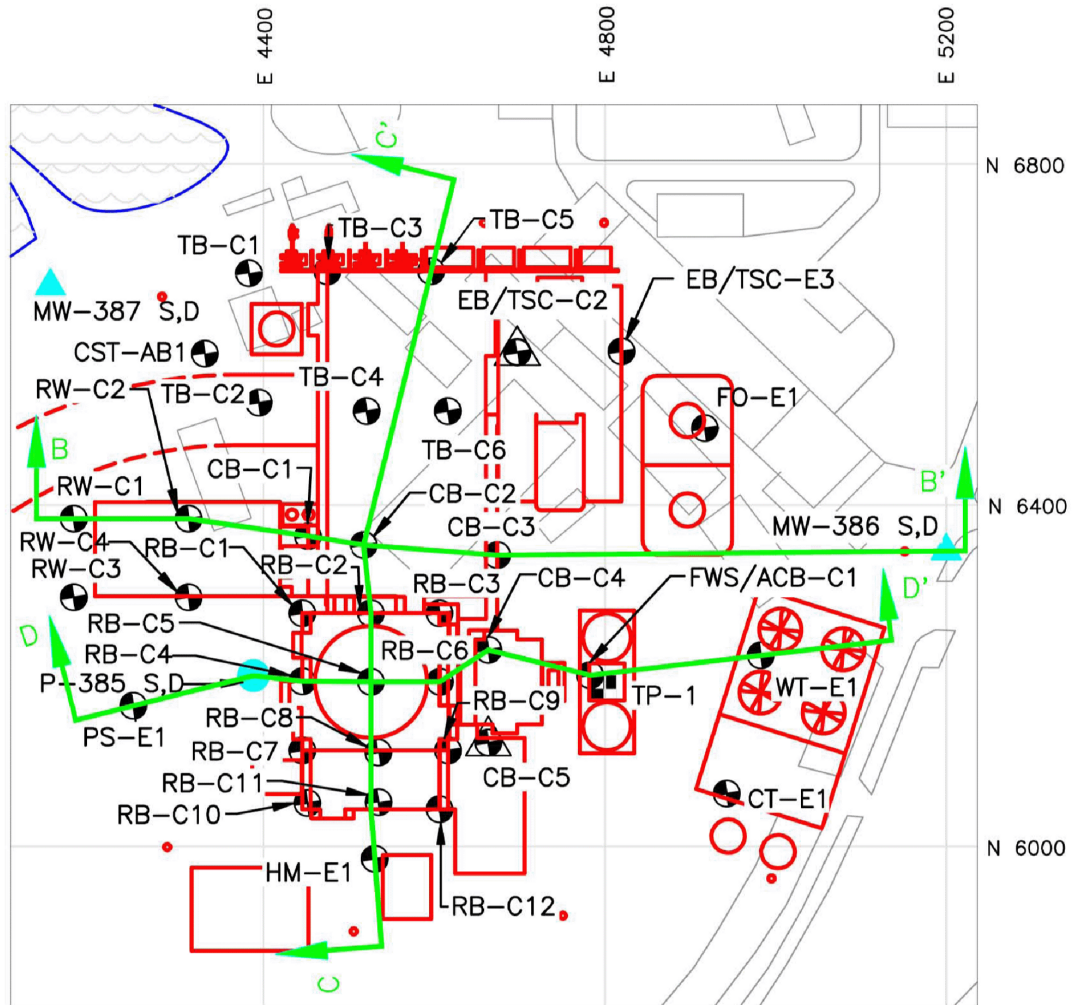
Enlargement of Site Exploration Plan [EF3 COL 2.0-26-A]
